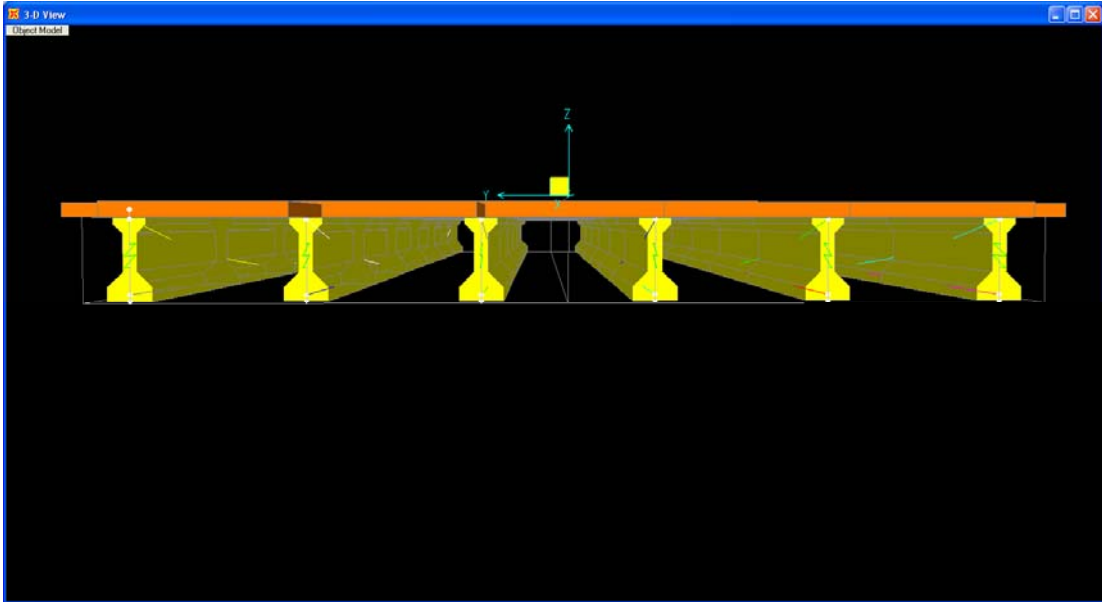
SAP2000 Model of Prestressed Concrete Beam Bridge
